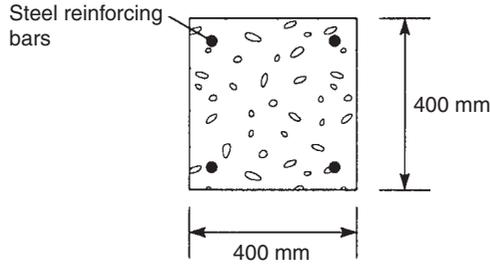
Reinforced concrete column of Ex. 7.5
